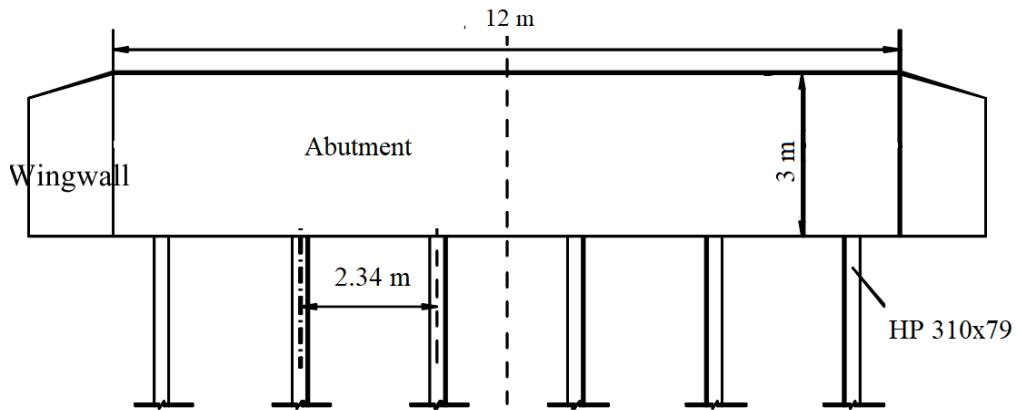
Abutment and Pile Details (after Huang et al. 2004)
